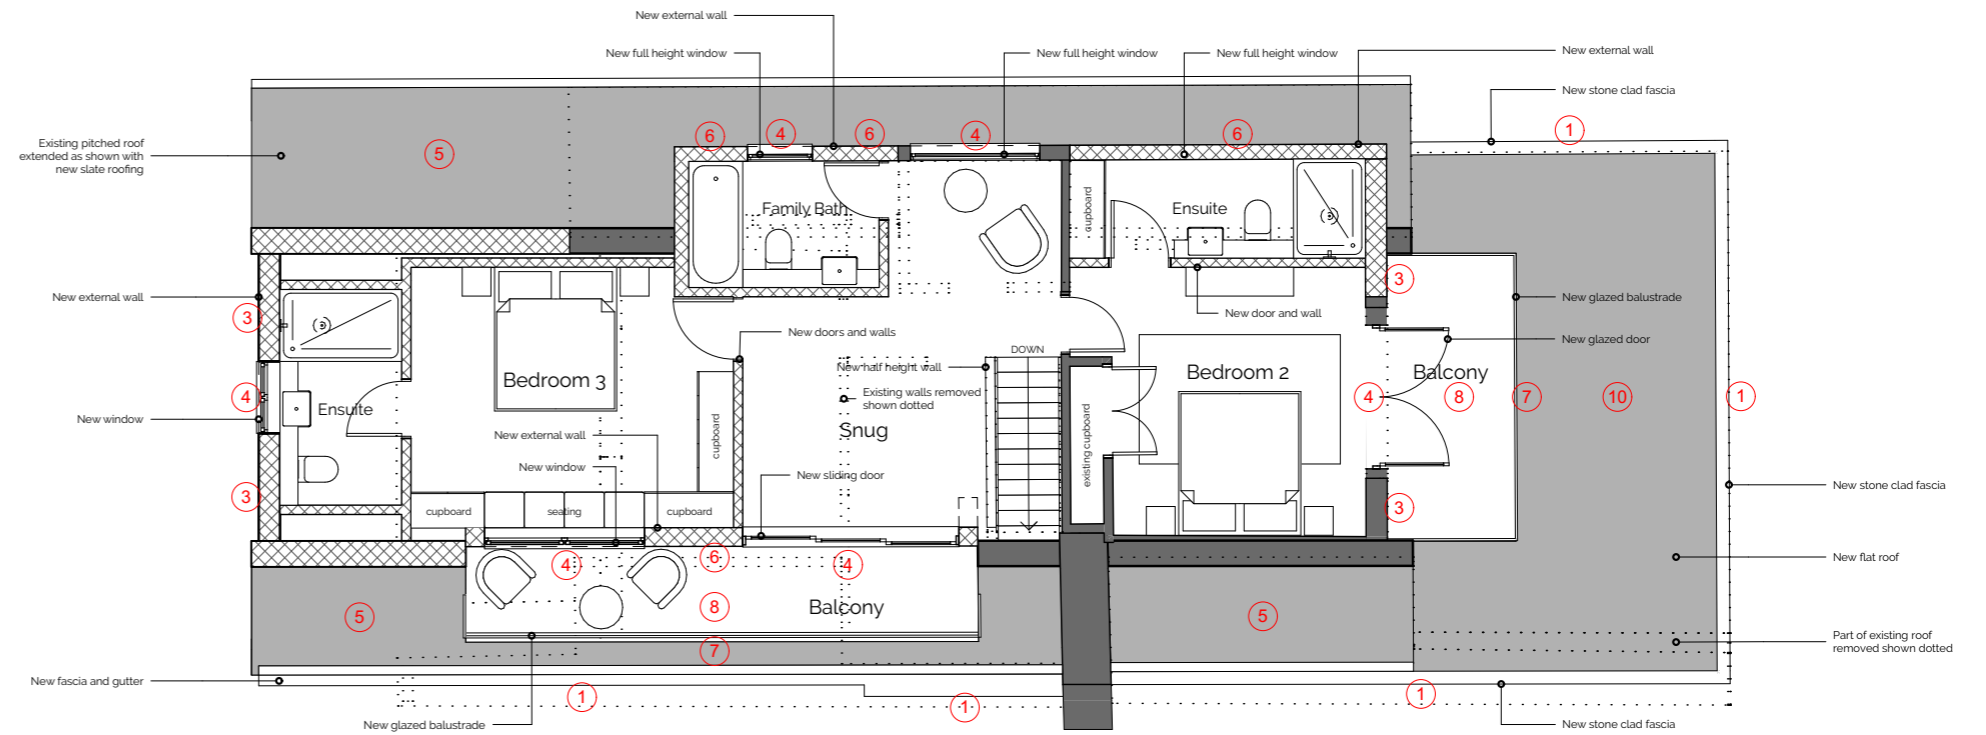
71 Leeson Road Proposed First Floor Plan - Not to Scale
